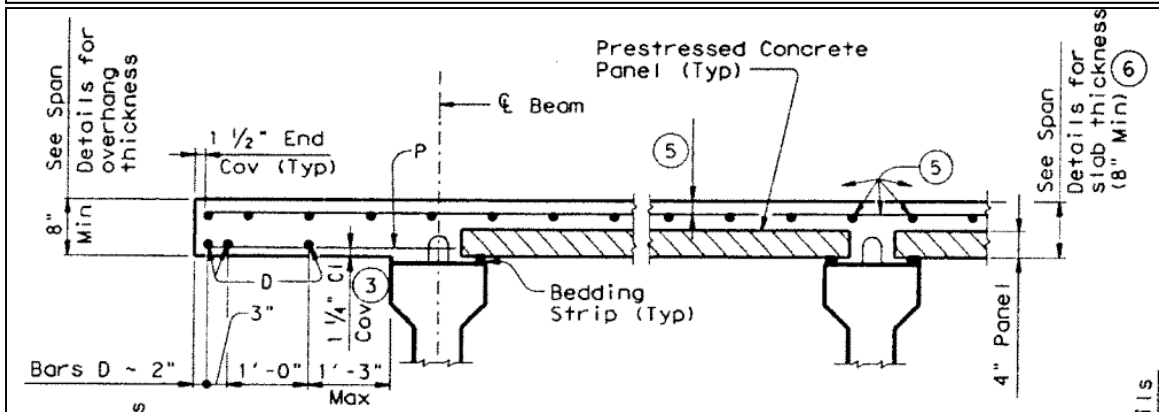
Elevation of Georgetown bridge deck: summer pour.
